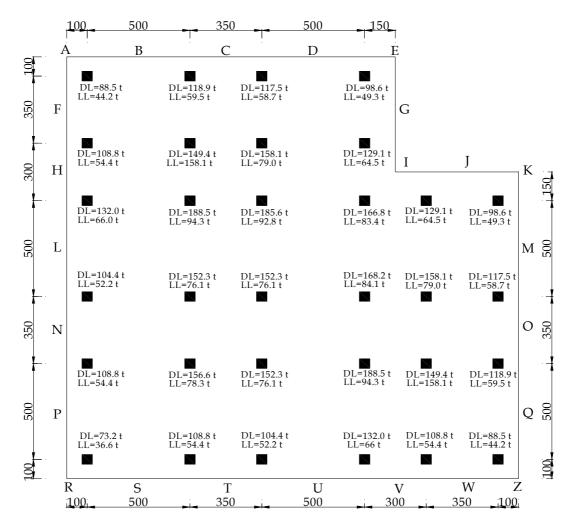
Layout of L-shaped mat foundation and columns loads
